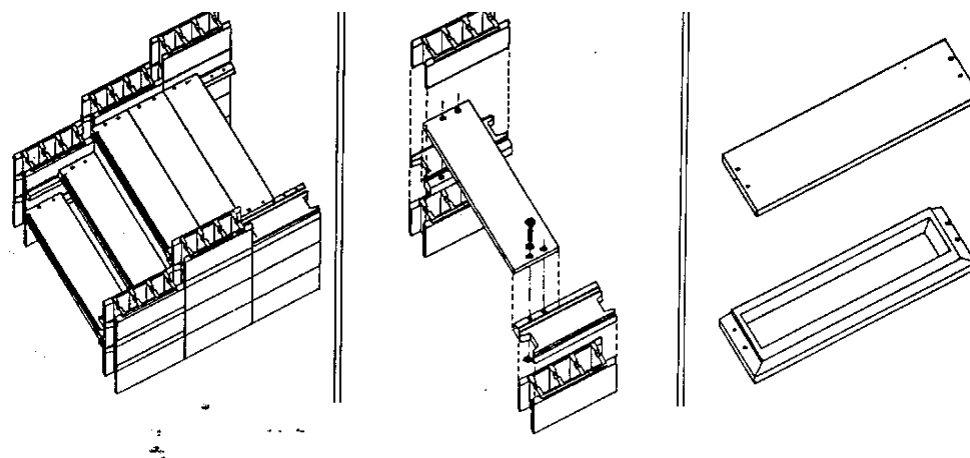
The Jordanian stair of Building System # 5 (RSC 1988)(6).
